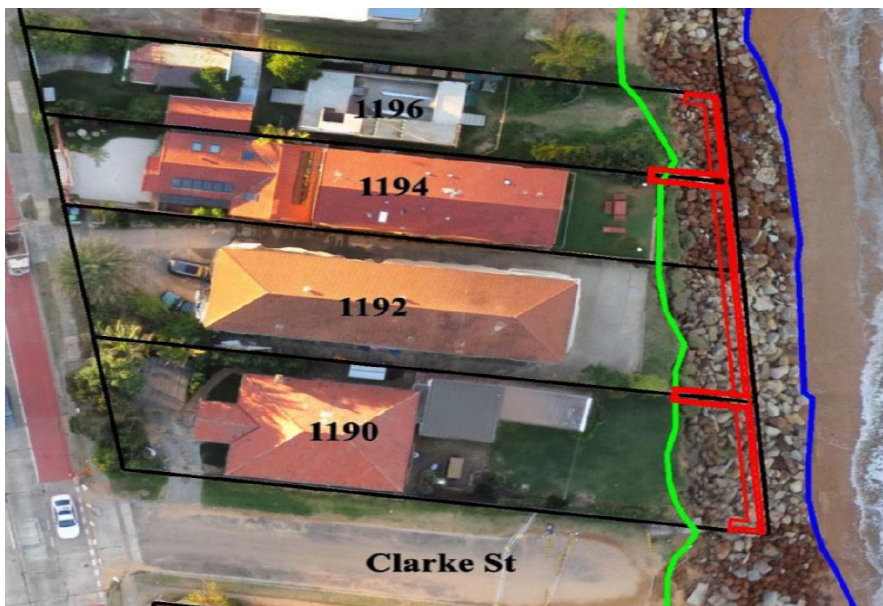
Aerial photo post-storm (8 June 2016) of the southern section of the subject properties (black), seaward (blue) and landward (green) edge of existing protection works, and proposed works (red) (source: SEE Horton Coastal Engineering)
